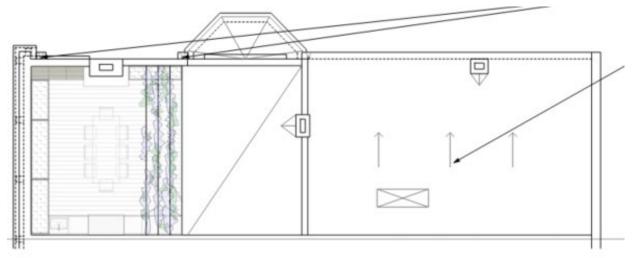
Proposed roof plan showing sunken roof deck at the west end of the roof
